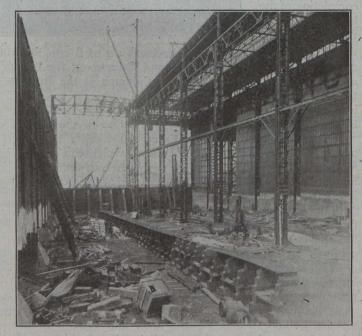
First Section Completed and Start Being Made on Second Section. Looking Toward Water End. Note Struts in Background, Bracing Flitch Dam
